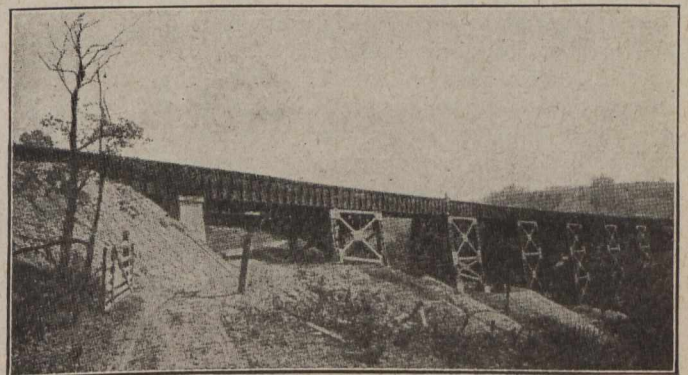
Viaduct with Steel Towers. Typical of 1915 Construction.
